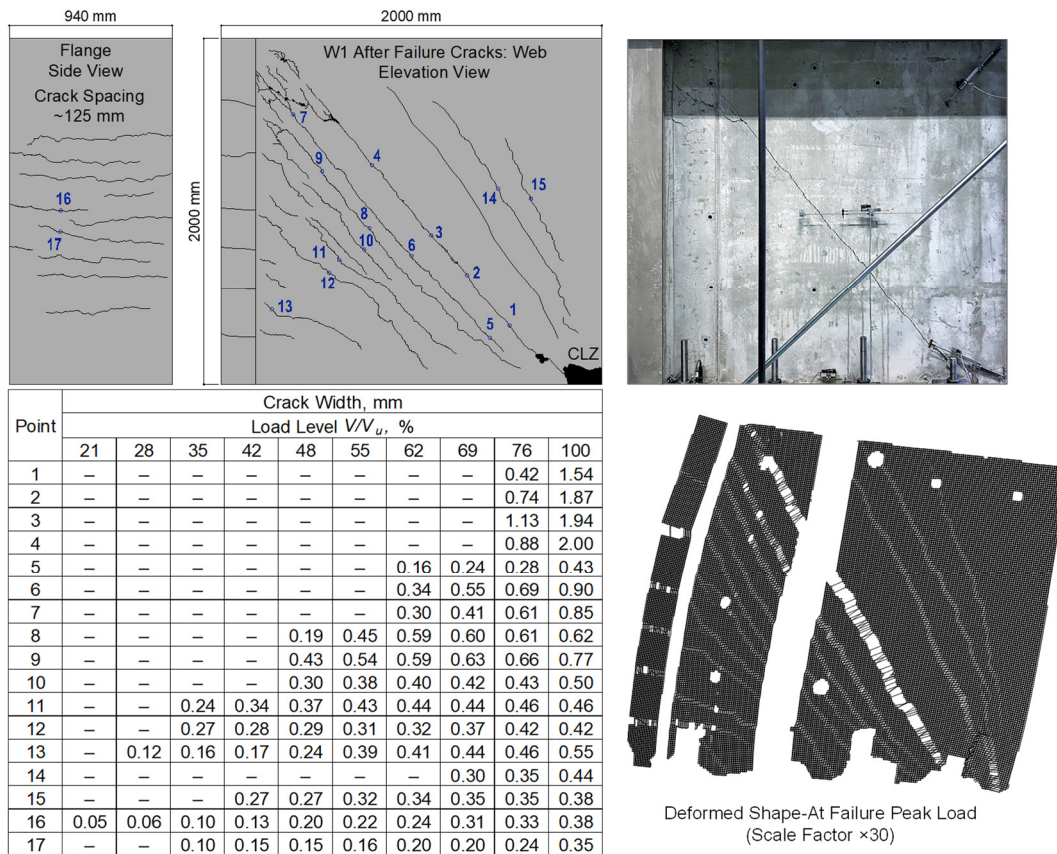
Crack pattern (major cracks) of wall W1 after failure, crack widths at various load levels, and deformed shape at peak load.
